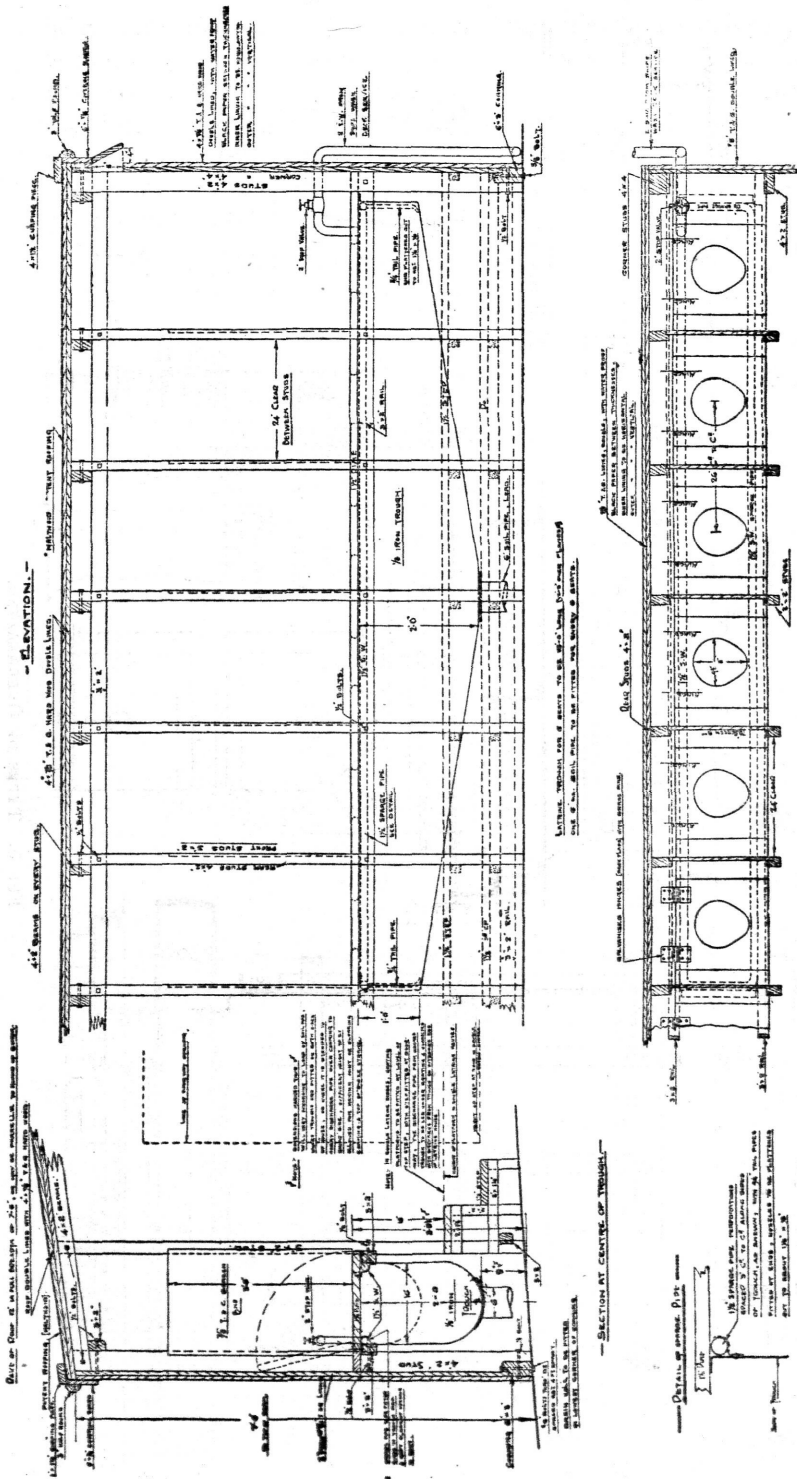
TROOP LATRINES AND DECK HOUSE CONSTRUCTION.
